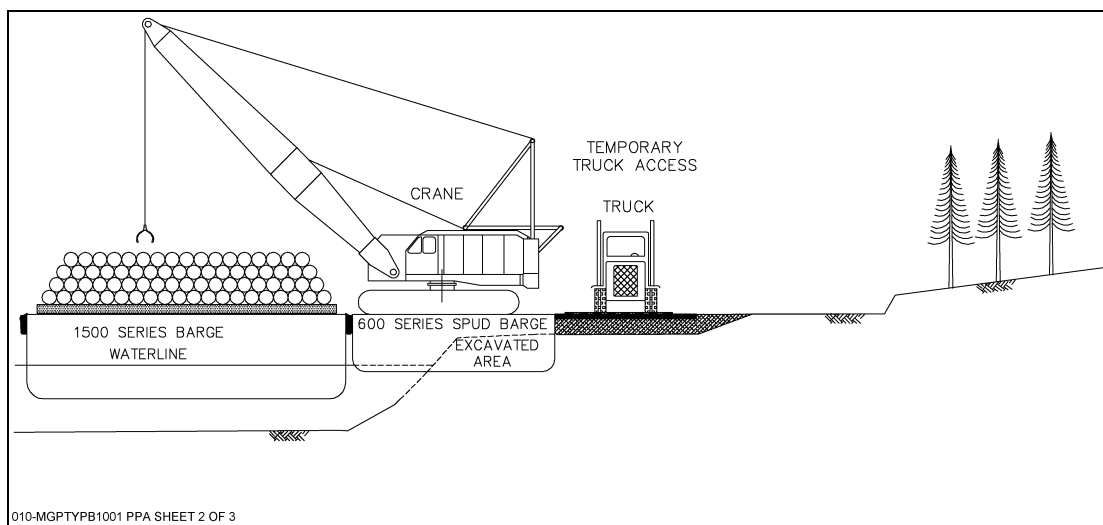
Typical Pipe Unloading from 600 Series Barge
